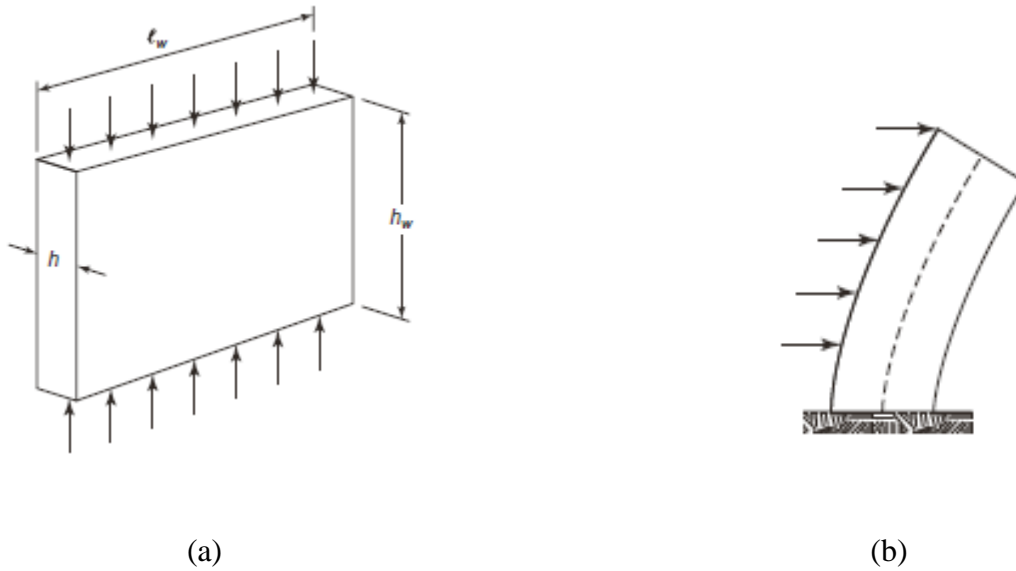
(a) Bearing wall; (b) Shear wall (Wight 2016)
